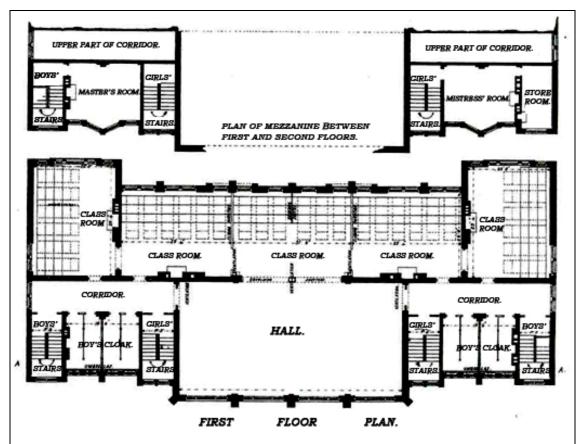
Plan of the first floor and mezzanine of Oban Street Board School, London designed by E R Robson for the School Board for London and published in "The Builder' on 24 September 1881
